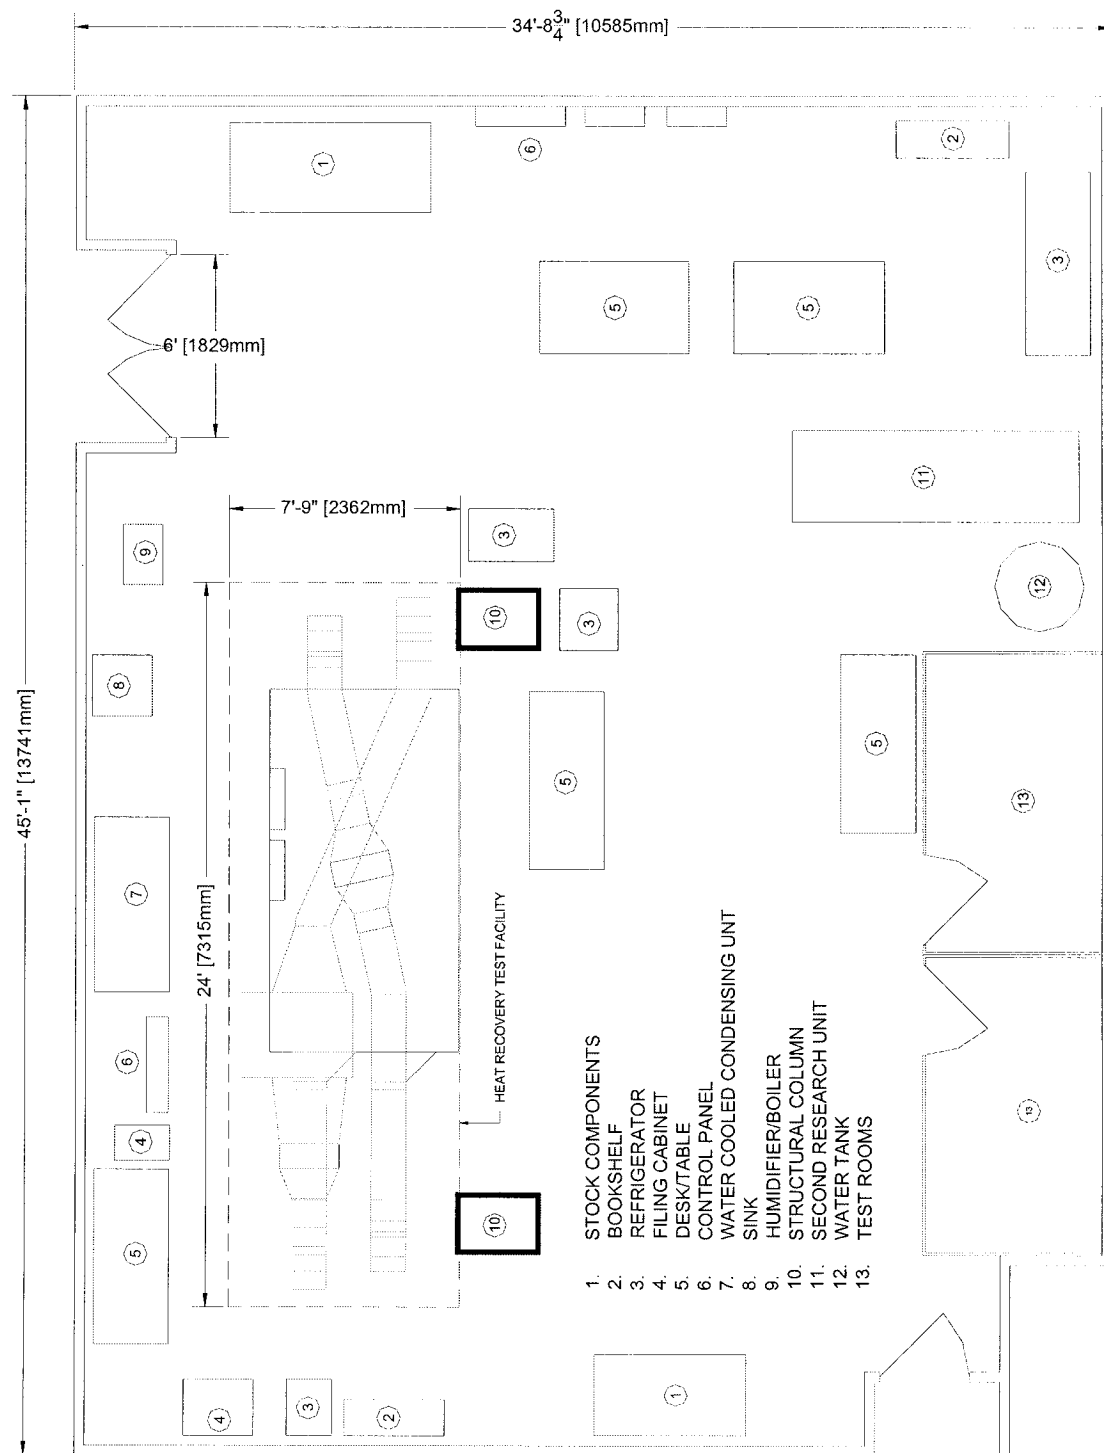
Layout of Heat Recovery Test Facility in the Existing Laboratory
